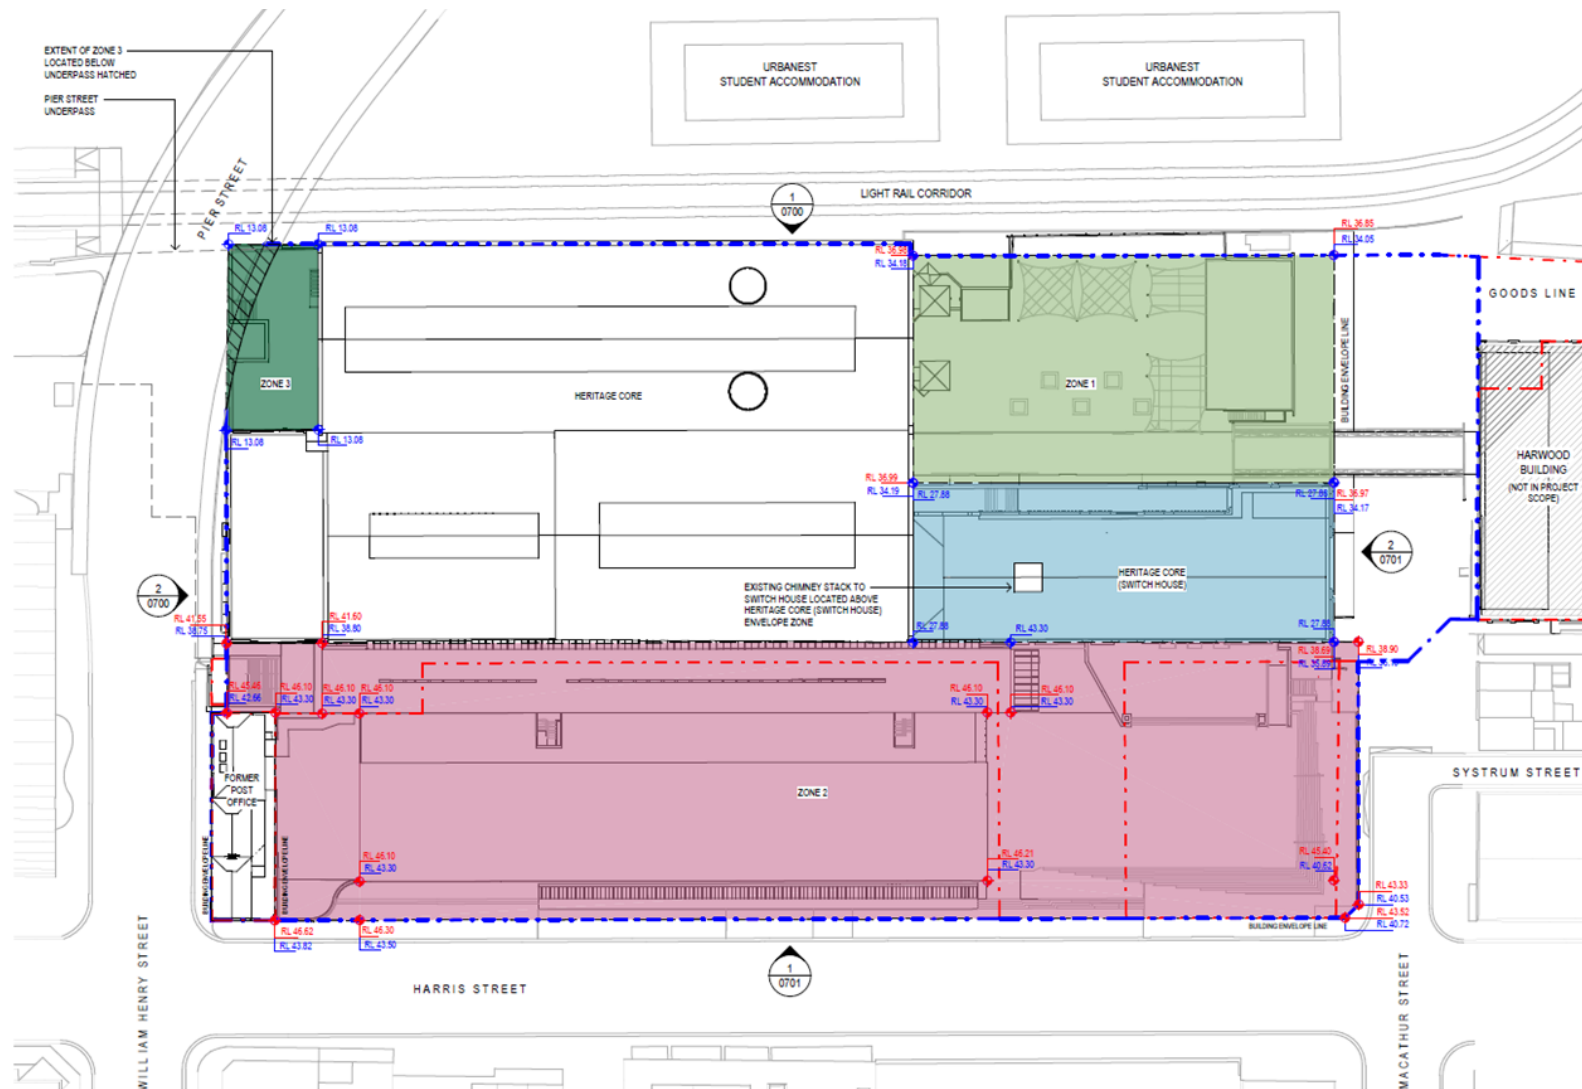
Ultimo Powerhouse- Building Envelope Existing Site Plan (Source: John Wardle Architects, 22 Feb 2022)
